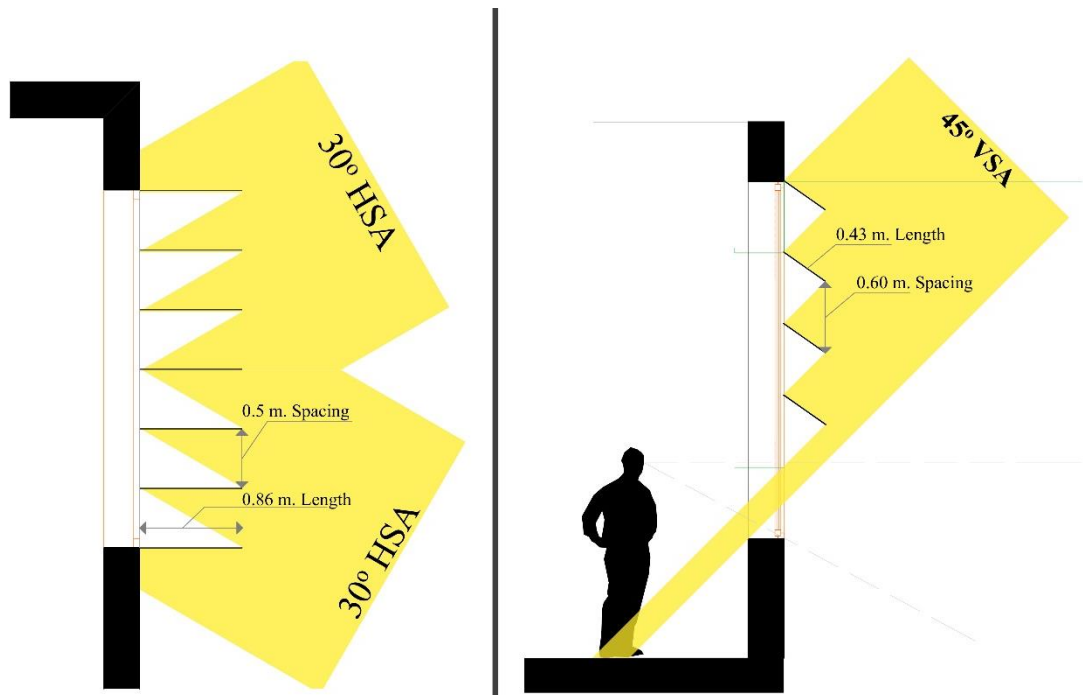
Optimized shading device strategy detail responding to the preferable (summer & winter) sun radiations for South-West façade, HAS 30°, VSA 45°. (Left) plan view (right) section (by Author).
